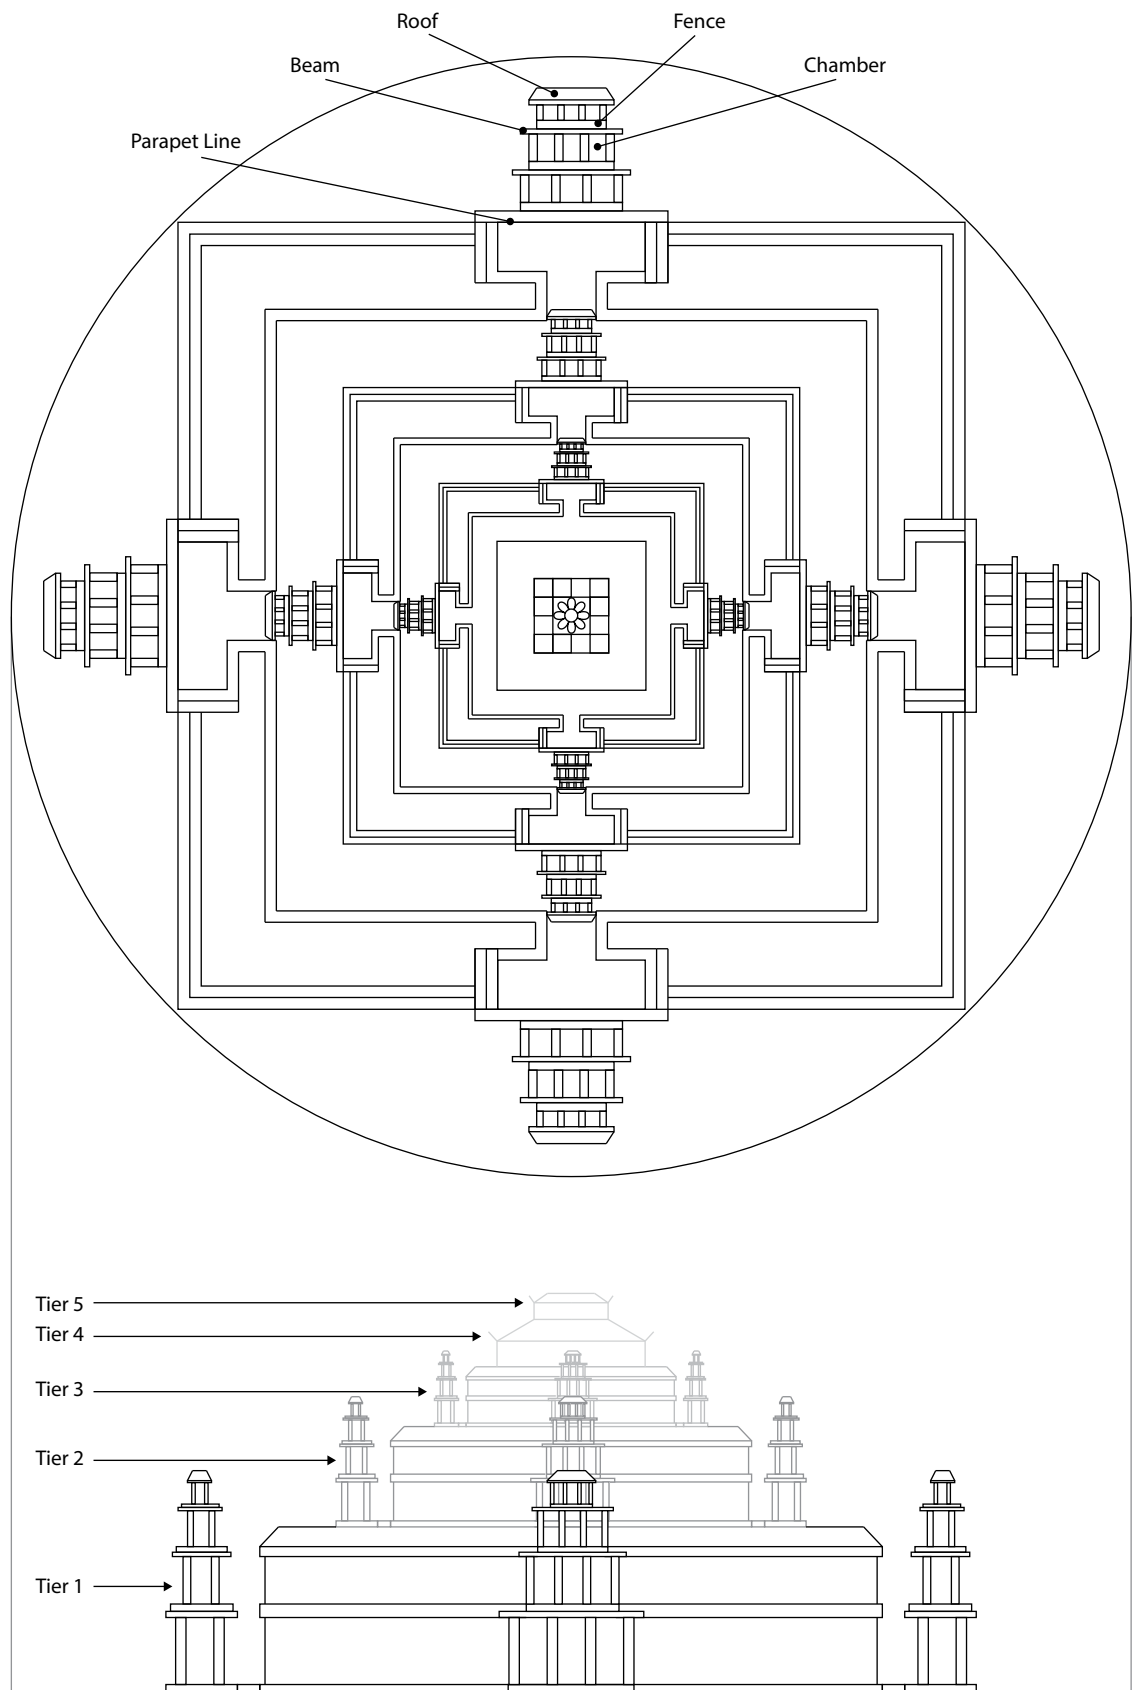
The Plan and Elevation of the Kalachakra Mandala, as adapted from Bryant (2003)- Alastair Brook 2023
